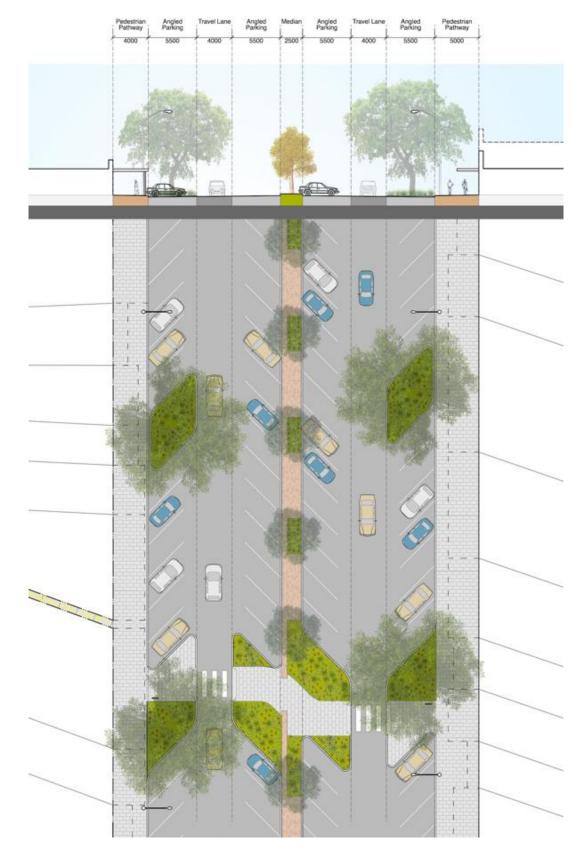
Typical treatment to Lang Street between Allworth & Hampden Street
